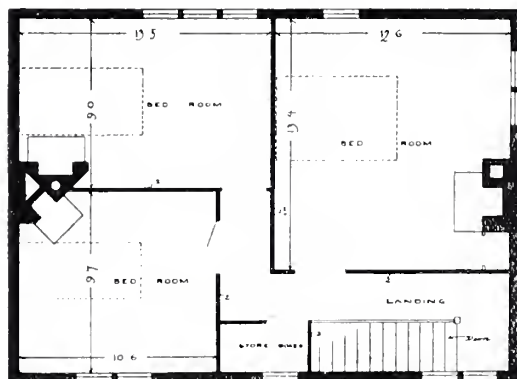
DETACHED COTTAGE CONSTRUCTED OF "MACKOLITH" TO FIRST-FLOOR WINDOW SILLS AND
